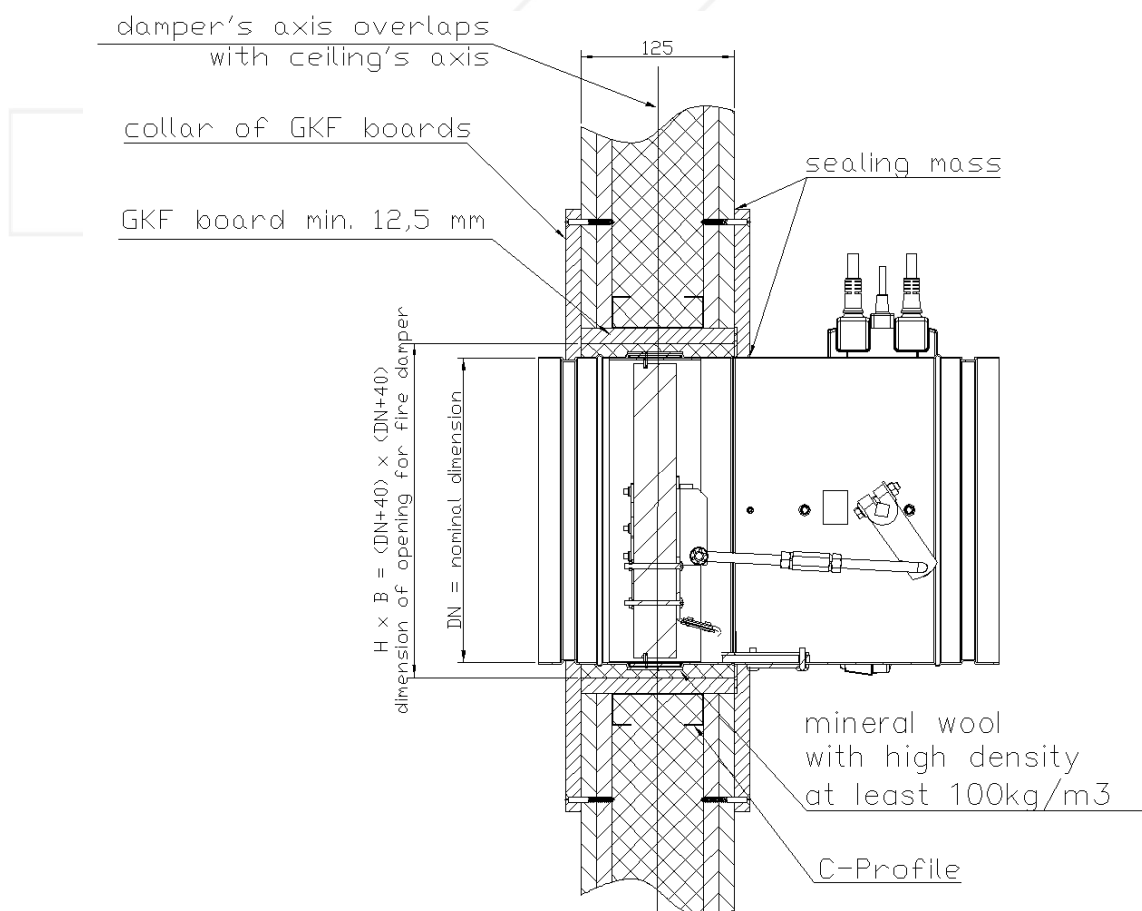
Installation method of fire dampers KTS-O in flexible wall with 125 [mm] thickness
